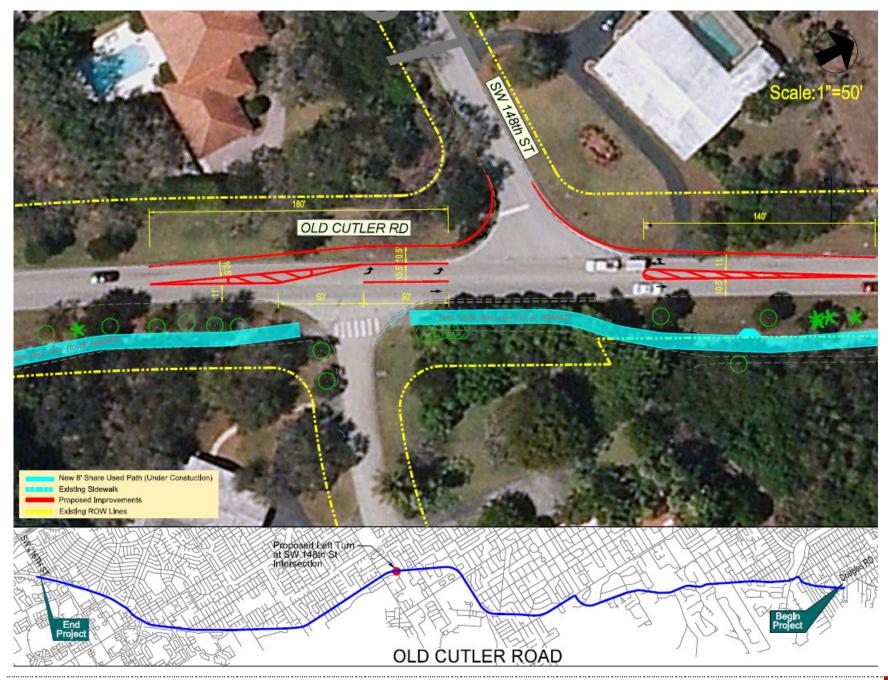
OLD CUTLER ROAD - POTENTIAL IMPROVEMENTS AT SW 148 STREET
